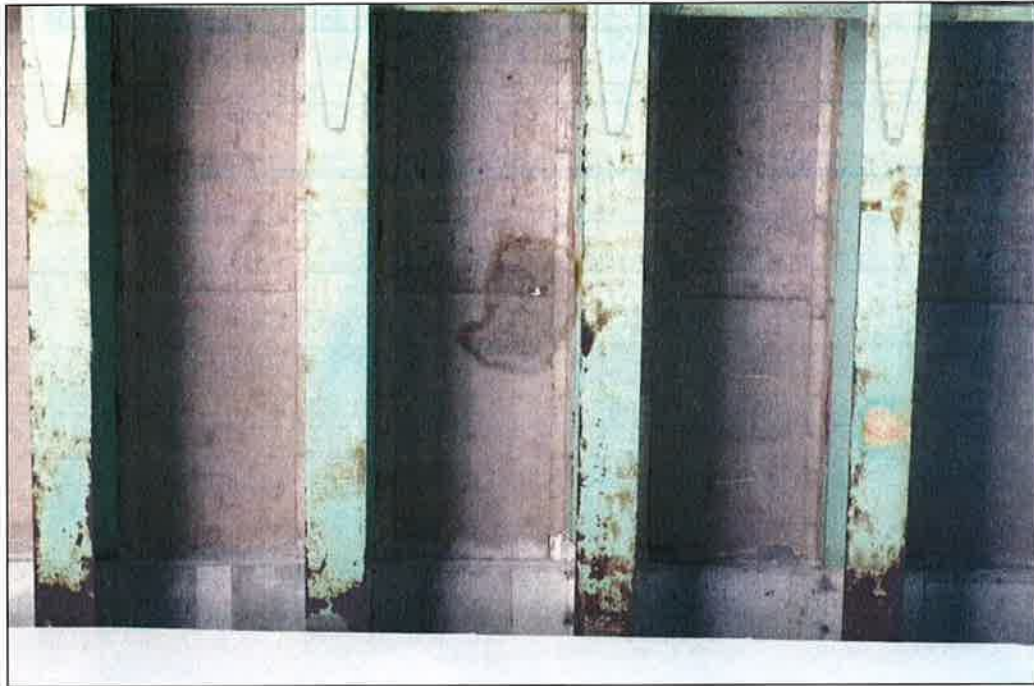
Typical Condition of Soffit (Bent 85-86) (fair condition – stained and unstained cracking, delaminations and patches)
